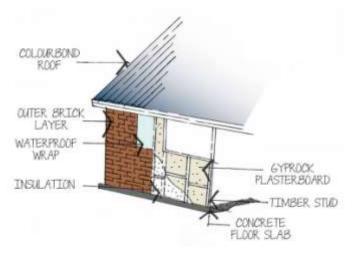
An example of a typical brick veneer construction. This illustration displays an outer brick shell and internal plasterboard lining.
